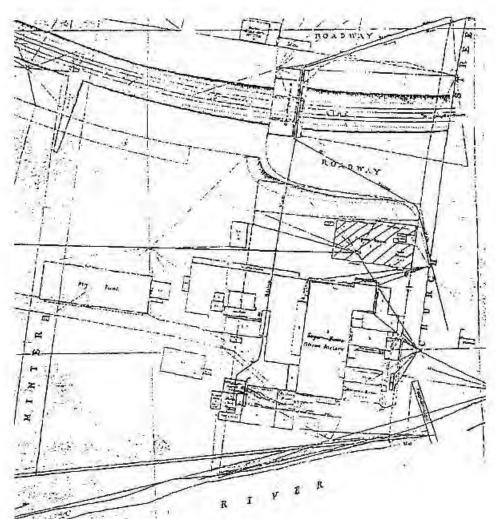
Metropolitan Water Sewerage & Drainage Board site plan for the former sugar works site in 1912, showing the extent of buildings constructed to house the Huttons factory. (Source: Howard, 1995, p28)
